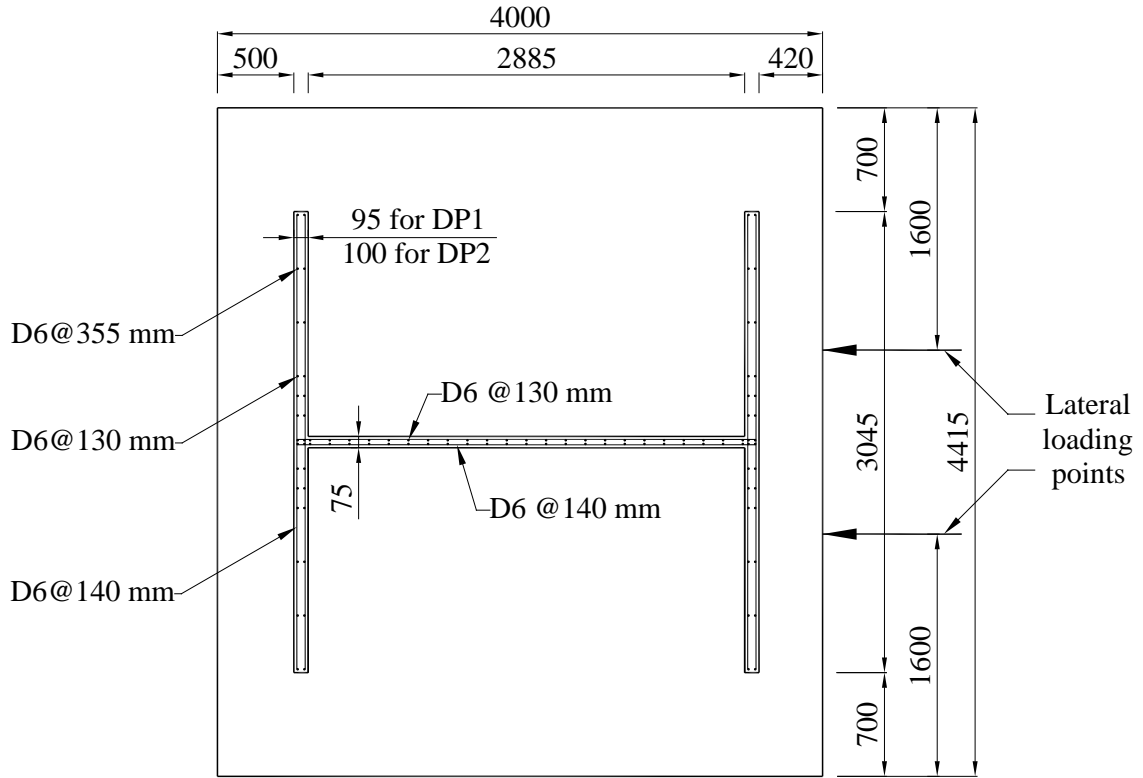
The dimensions (in mm) and reinforcement layout of Palermo shear walls DP1 and DP2
